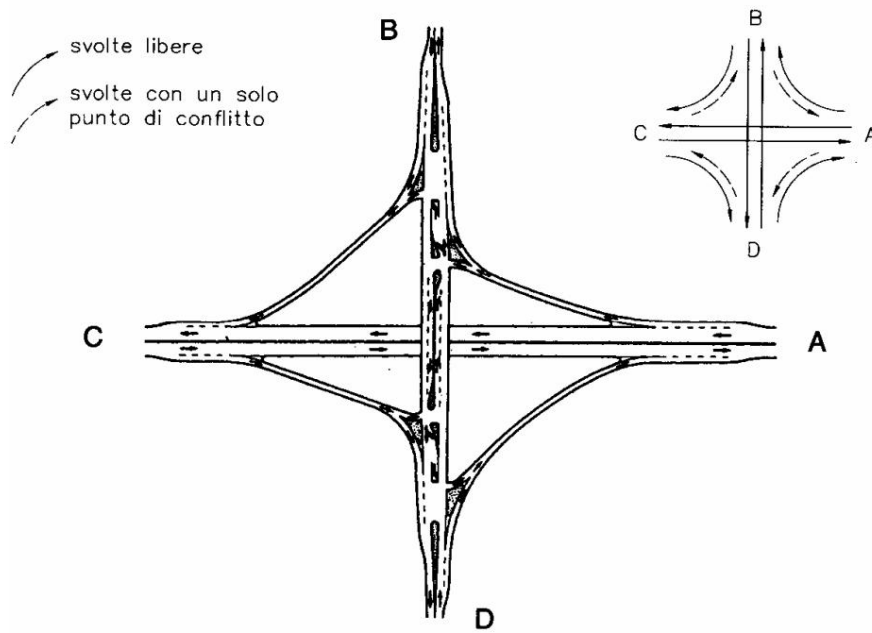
Diamond-shaped intersection with planimetric staggering of the ramps
